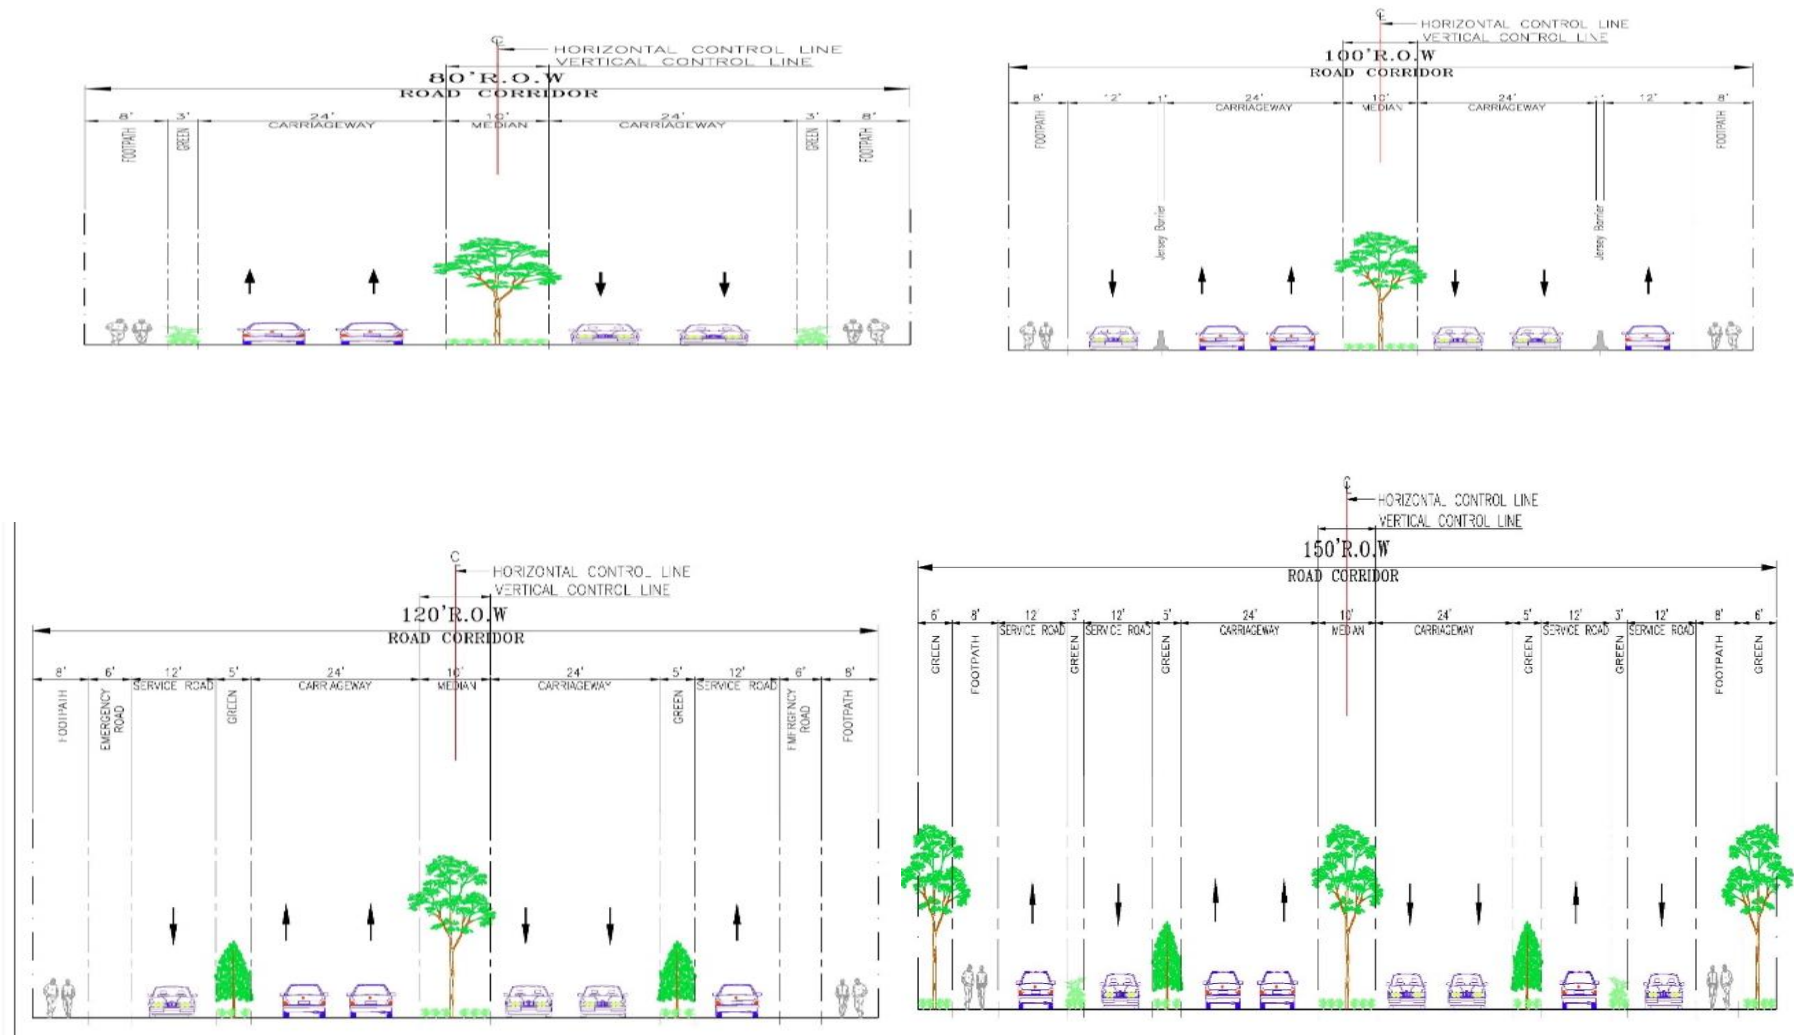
Typical Road Cross Sections for Proposed New Road Network
